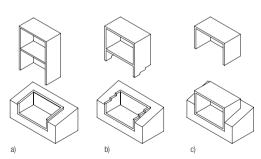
Plinth forms for sloping sites a) Building in open excavation ("protective screen") b) Building, or rather superstructure, supported on sides of excavation o: "Basement storey" supporting upper floor
